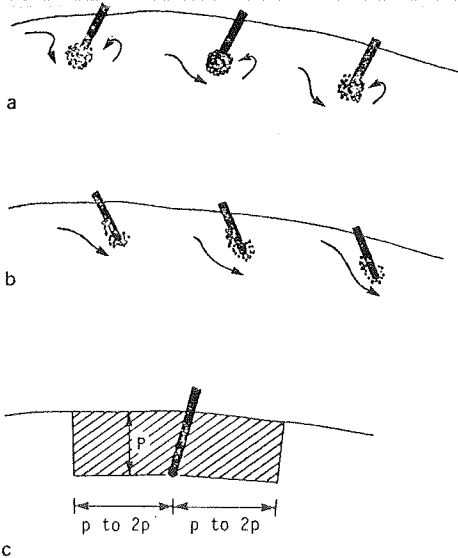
Orientation and spacing of spurs: (a) spurs pointed upstream; (b) spurs pointed downstream; (c) approximate area protected by a spur.
